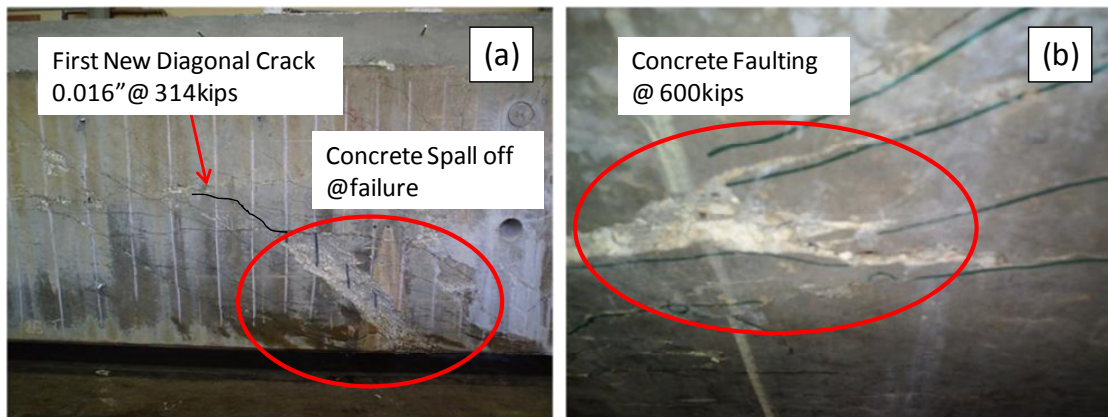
East side of RF-3R-9-A (a) Location of the new diagonal crack and spall concrete (b) Faulting
